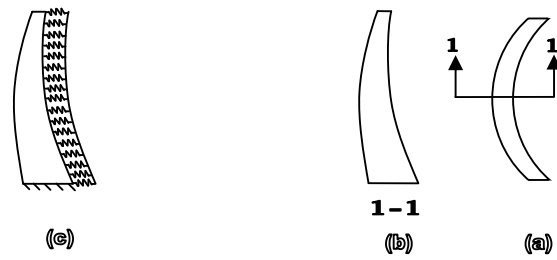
(a) Arch Element (b) Cantilever Element (c) Cantilever Beam Resting On an Elastic Foundation
